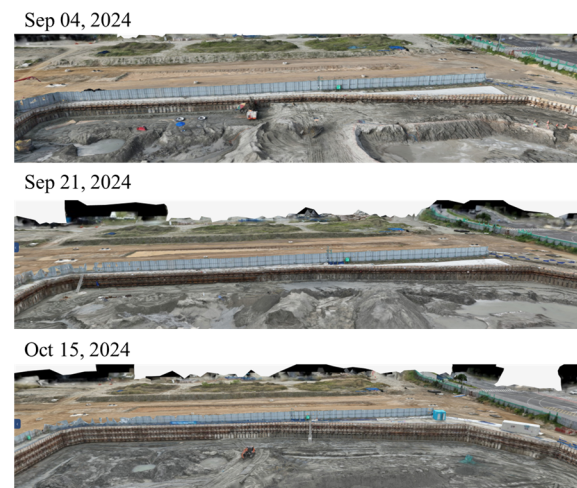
Excavation process of temporary earth retaining wall at Songdo site.
